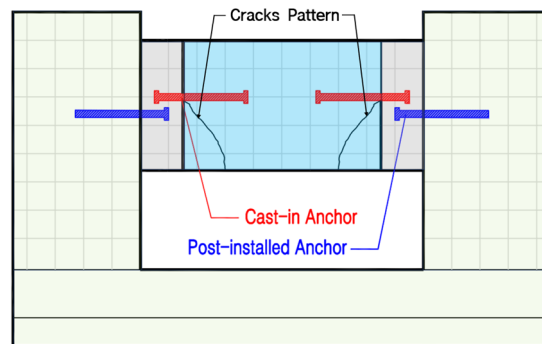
Initial cracks developed at the connection of the PC member and advanced into breakout failure.
